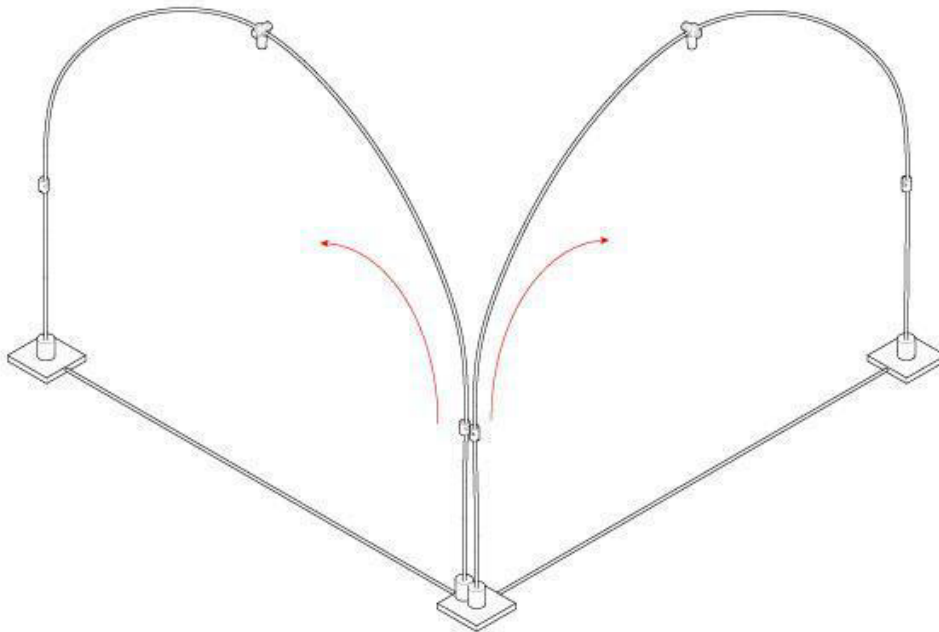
Bending 36-inch GFRP rods to place in single footers
